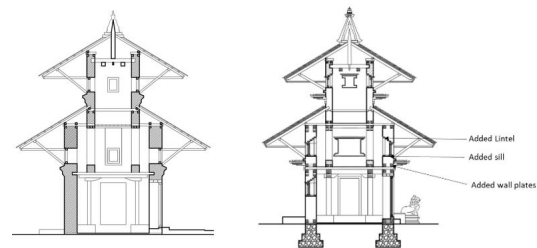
Section old (left) and new (right) showing wall plates added and increased depth of foundation
